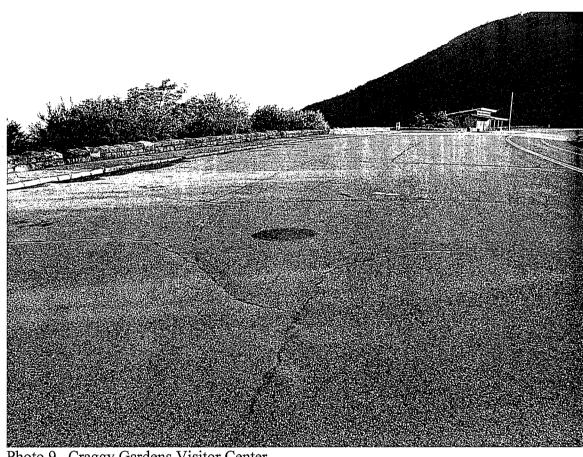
Craggy Gardens Visitor Center Thermal Cracking
